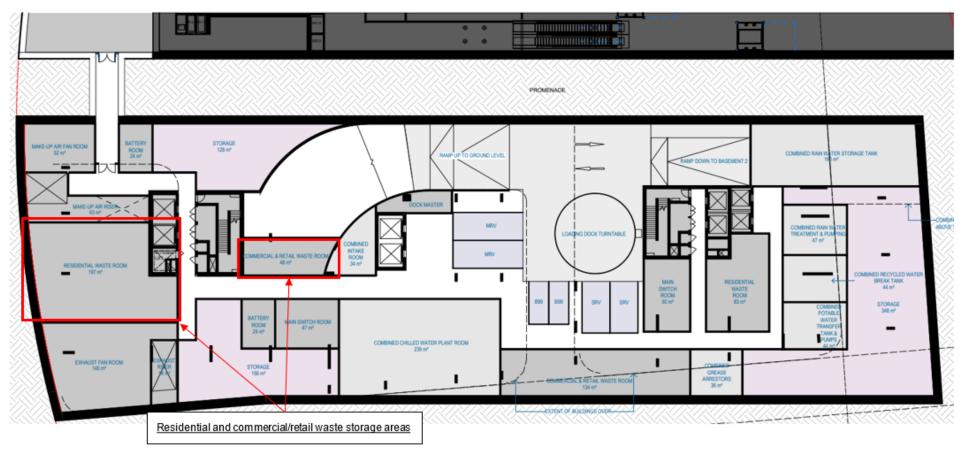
Building 3 Main waste storage room, basement level 1 design
